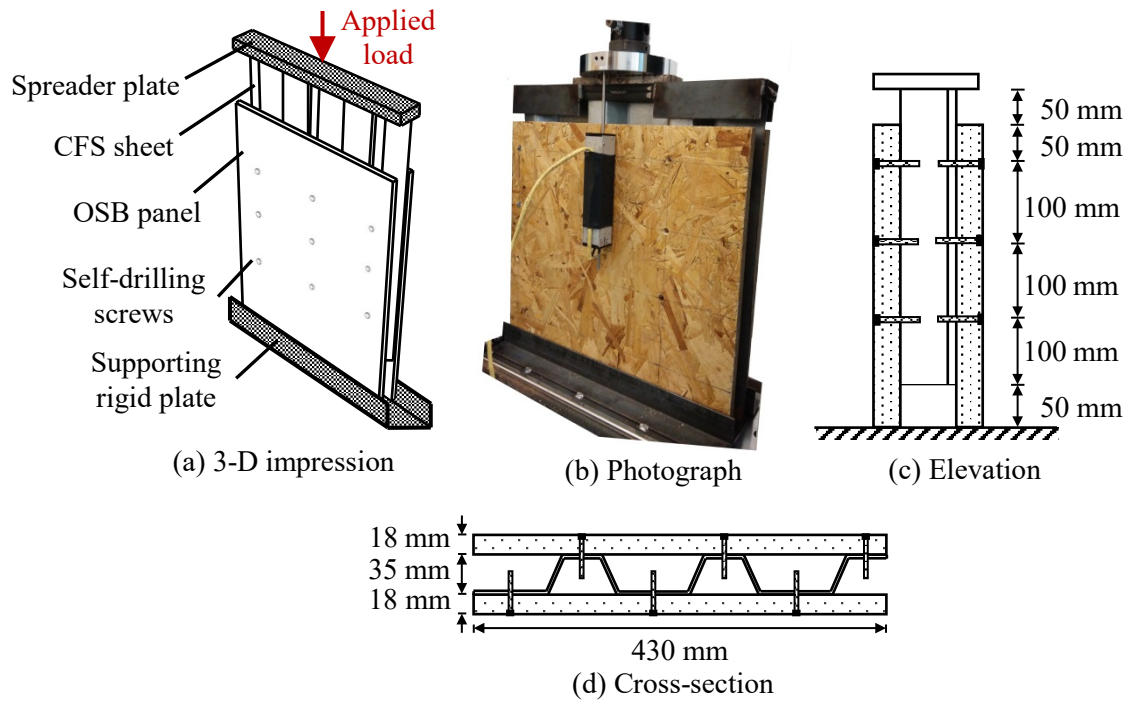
(a) 3-D impression, (b) photograph, (c) elevation and (d) cross-section of typical push-out specimen
